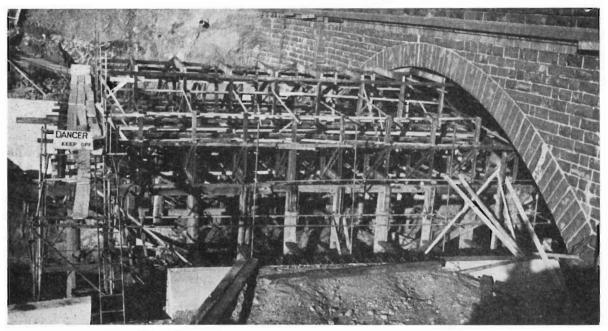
Coburg City. Murray Road. Bridge over Merri Creek during reconstruction and widening.
